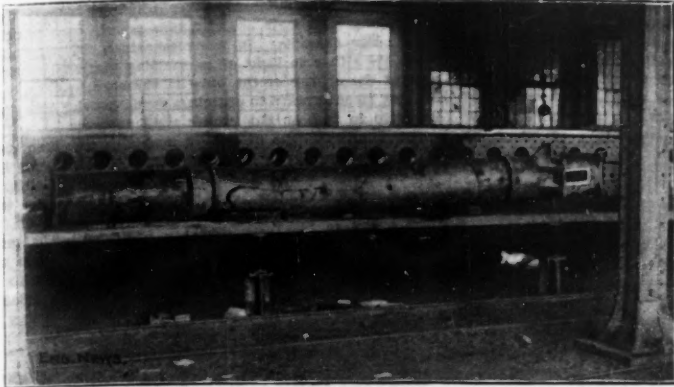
COLUMN B 4. SHOWING FRACTURE NEAR CENTER.
